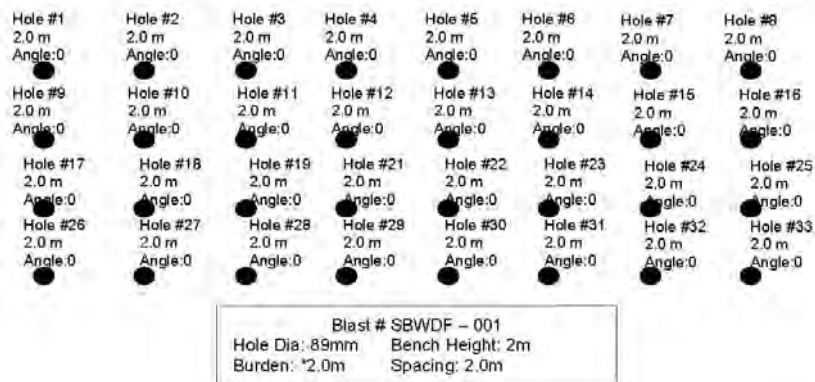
Example Pattern Layout Plan (Drillers Plan)
